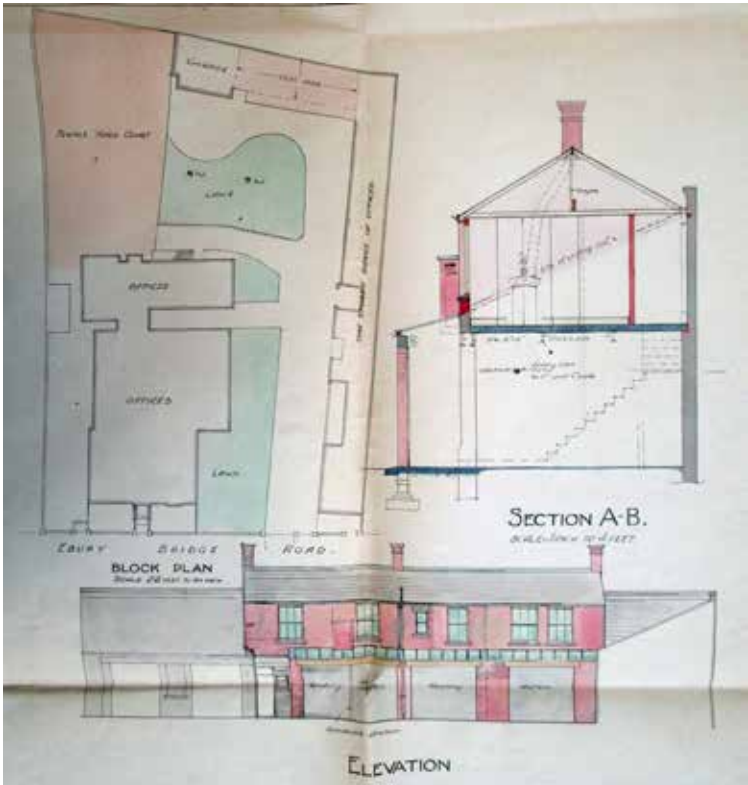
1924 Drainage applications and plans of the original building at 41 Ebury Bridge Road, subsequently replaced by Edgson House in 1955 (Westminster Catalogue).
